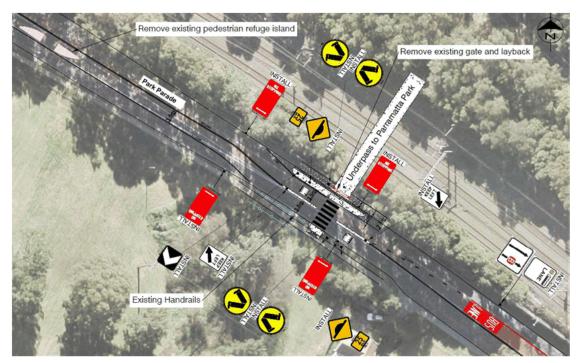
A concept plan showing the proposed pedestrian crossing in Park Parade, Parramatta as well as the existing pedestrian refuge island to be removed.
